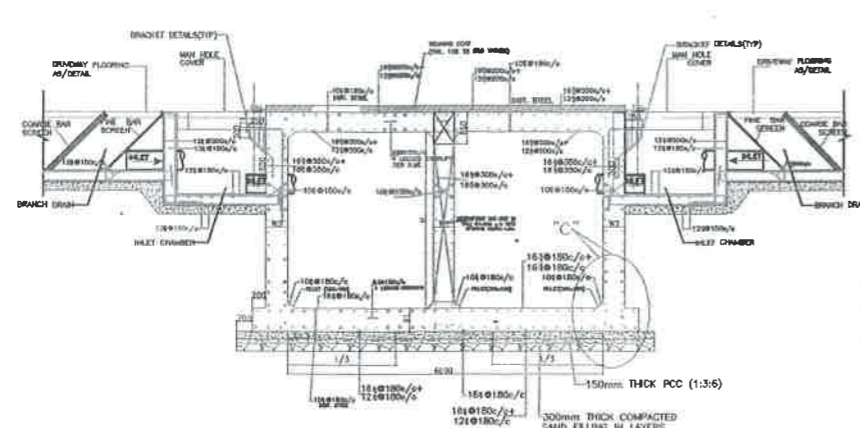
DETAILS FOR RCC DRAIN STRUCTURE (FOR CLASS II LOADING)
